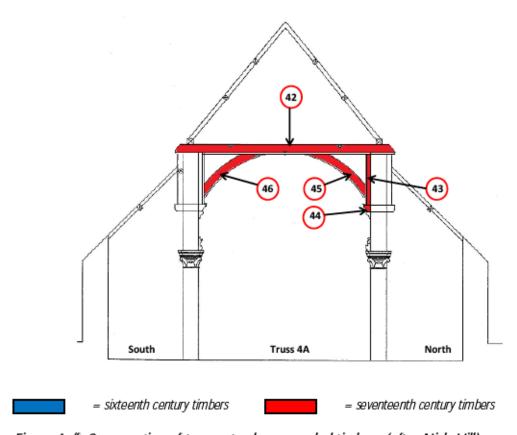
/f: Cross section of trusses to show sampled timbers (after Nick Hill)
